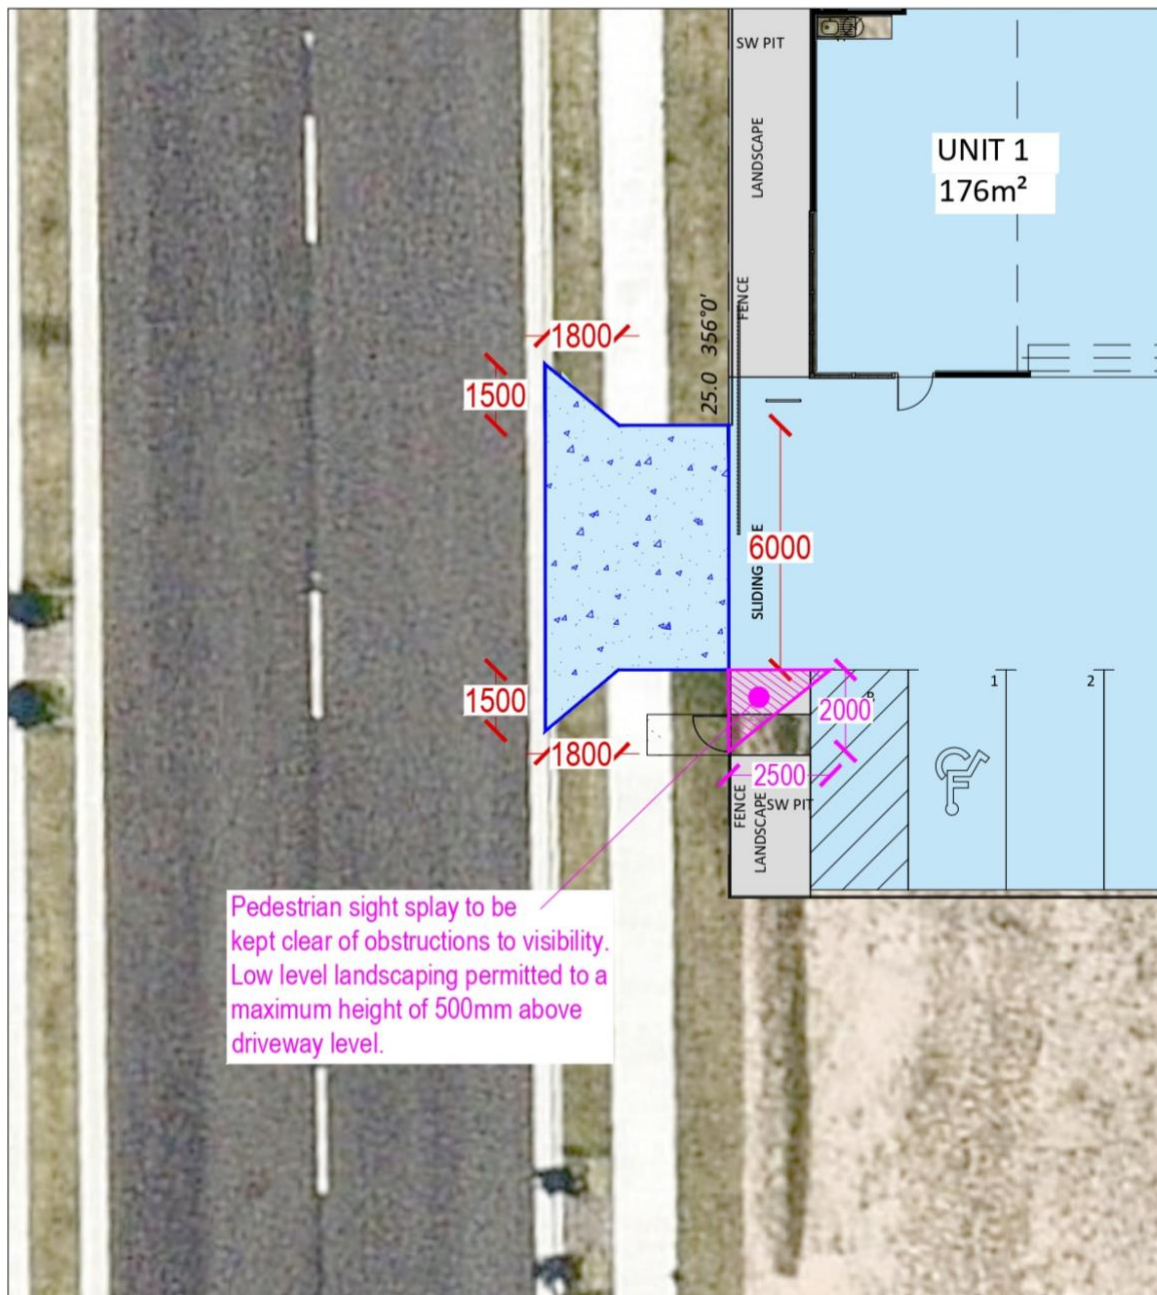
PROPOSED LAYOUT AND DIMENSIONS OF PROPOSED VEHICLE CROSSOVER
